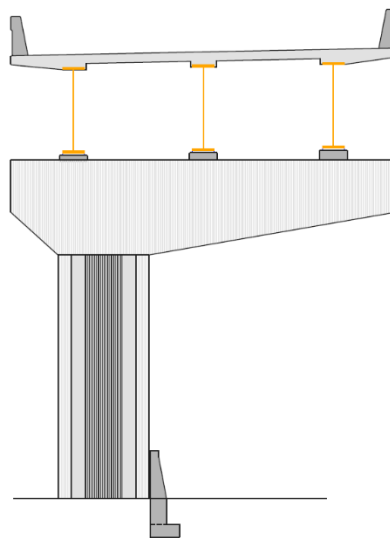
Typical Offset Hammerhead Pier – Piers 10
